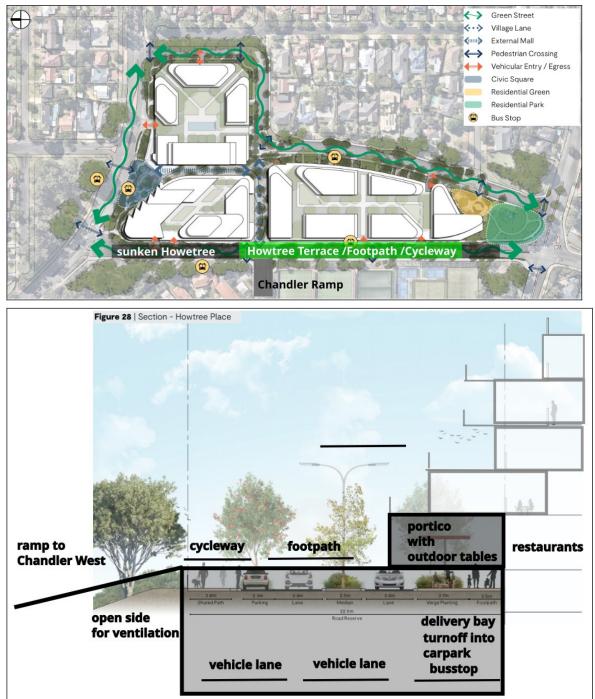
Schematic cross-section sunken Howetree Terrace with portico, footpaths and cycleways.
